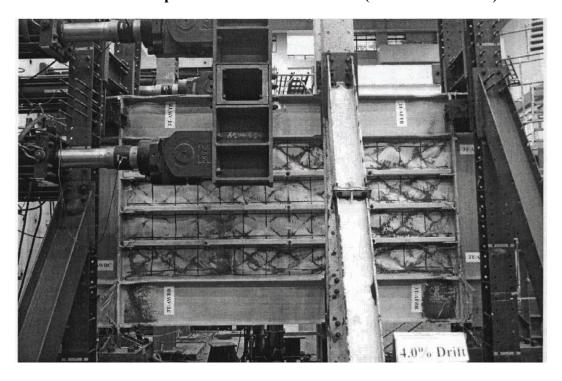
Specimen 3T Test at 4% Drift (Lin and Tsai 2004)
